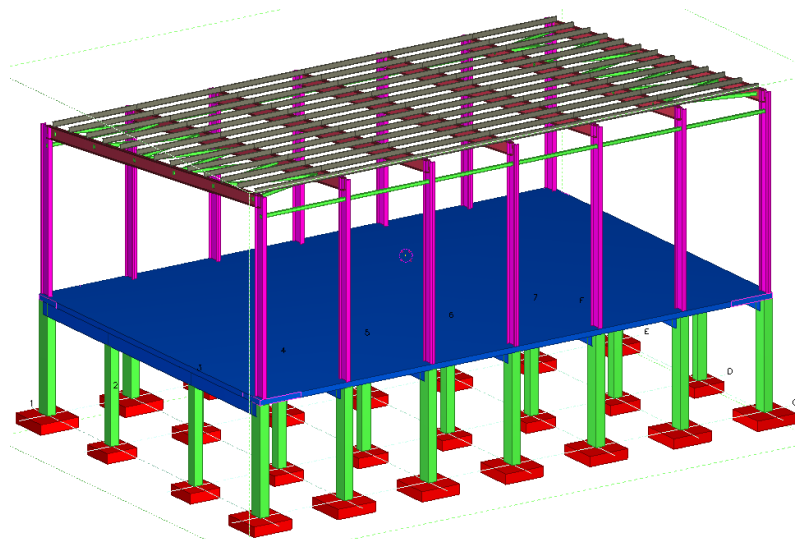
Structure modelled to assemble with the structure of silos (Structures, Tekla.)
